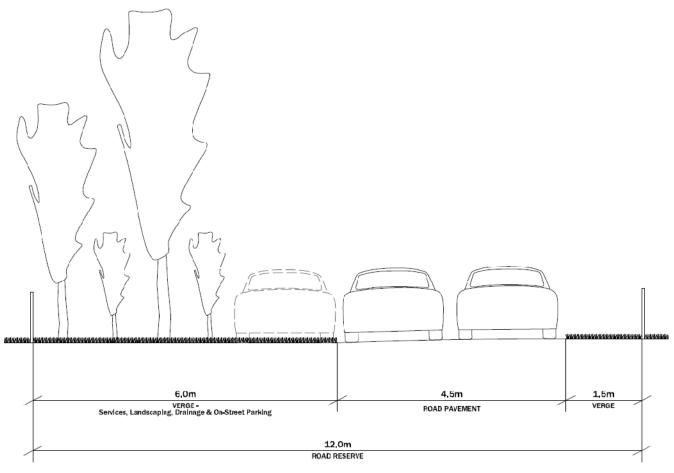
Indicative cross section of the one way road backing onto the existing residential area.
